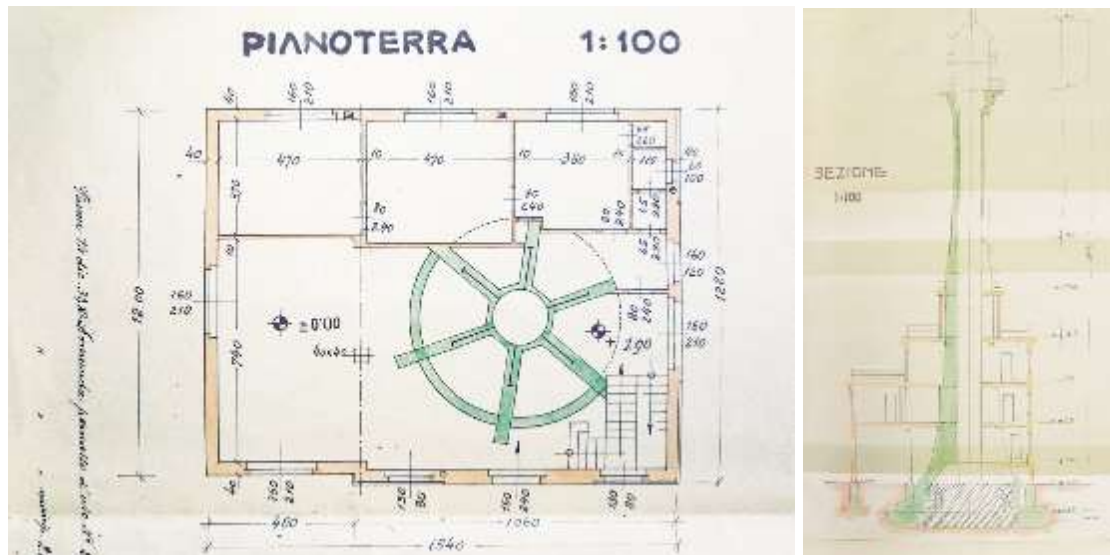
Lighthouse Mlaka: Ground floor and Section.
